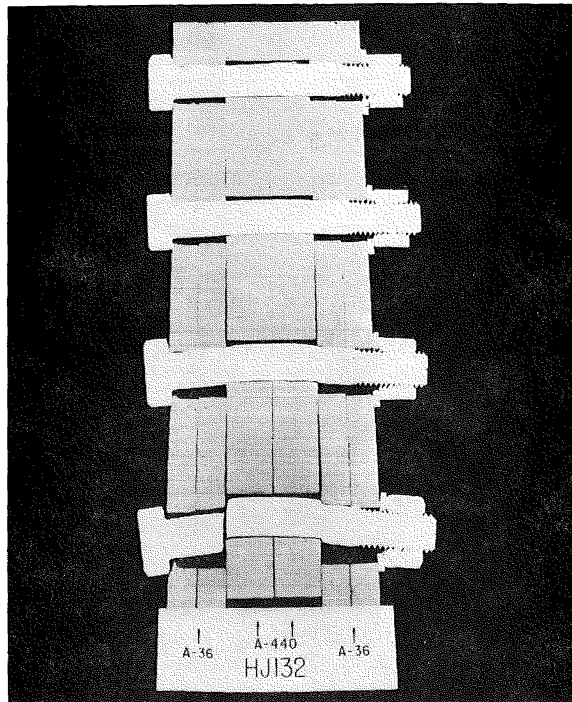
Section of Joint HJ132 Showing Bolt and Plate Deformations after Failure (Lap Plate End)
